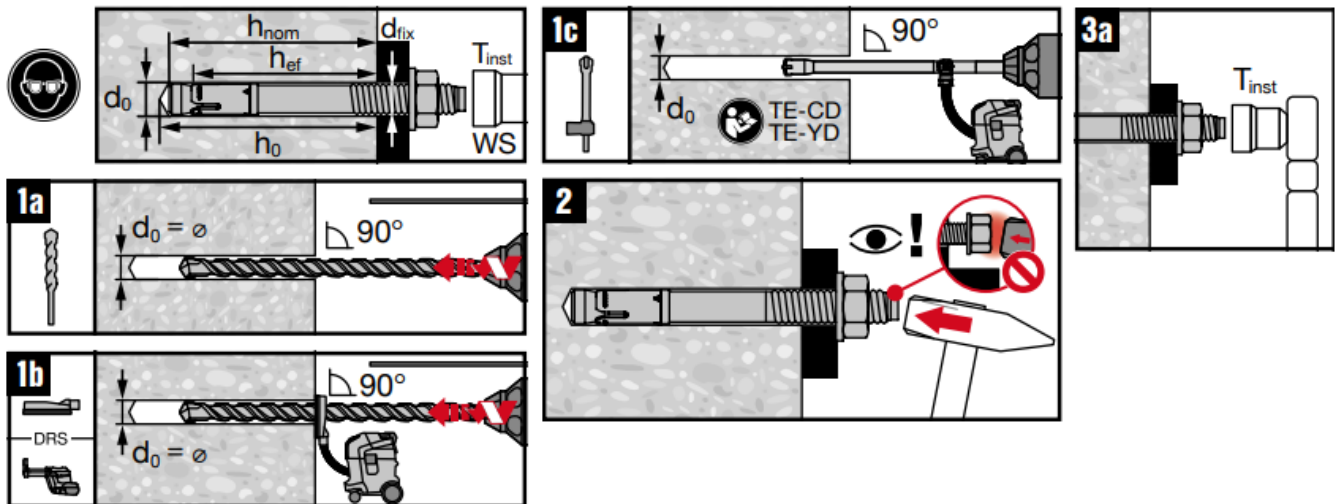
MANUFACTURERS PRINTED INSTALLATION INSTRUCTIONS
